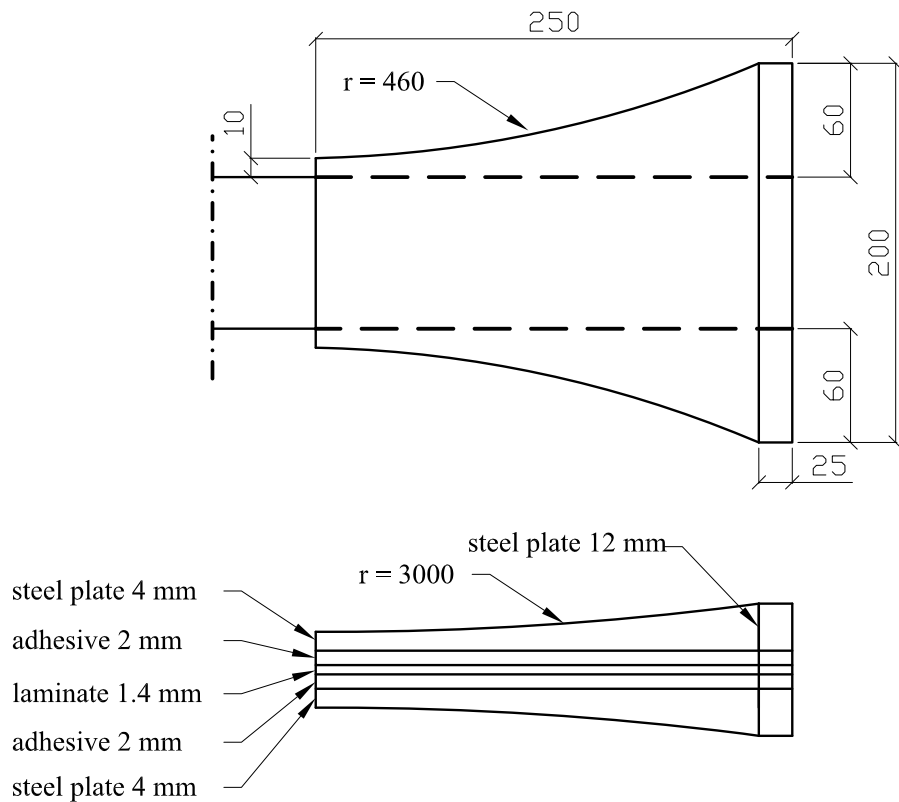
Parabolic anchorage plate with parabolic shape of the plate's cross-section [17].
